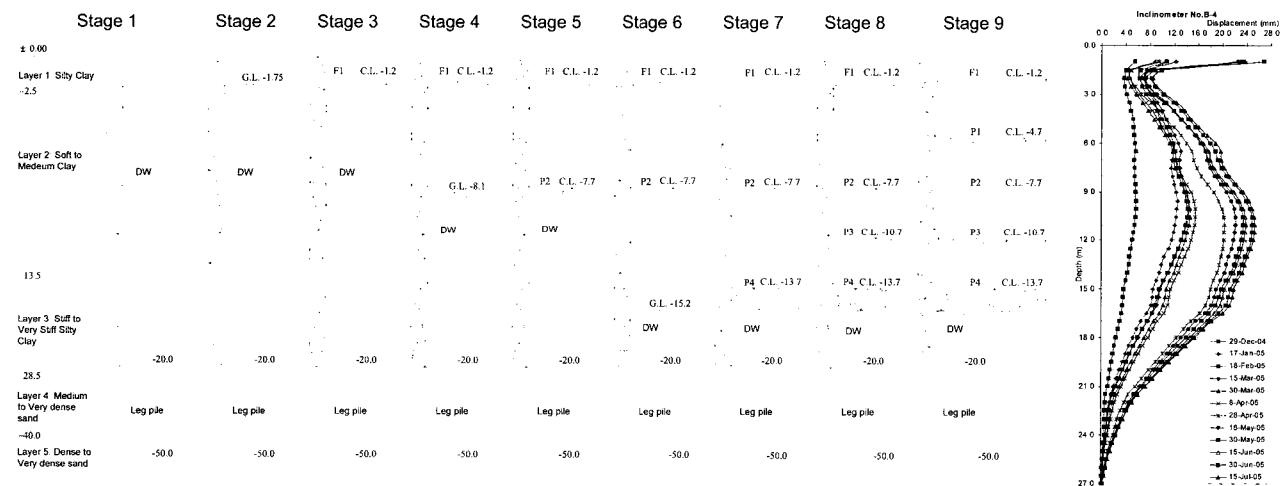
Process of excavation of top-down construction and inclinometer data of the BOT project
